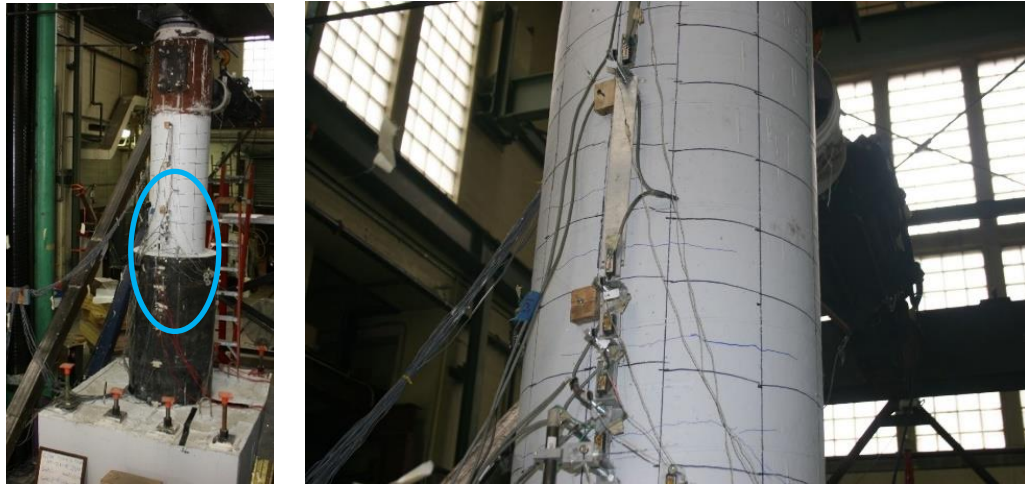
Specimen 30-21-R Horizontal Cracks on Northern Column Face at 0.8% Drift
